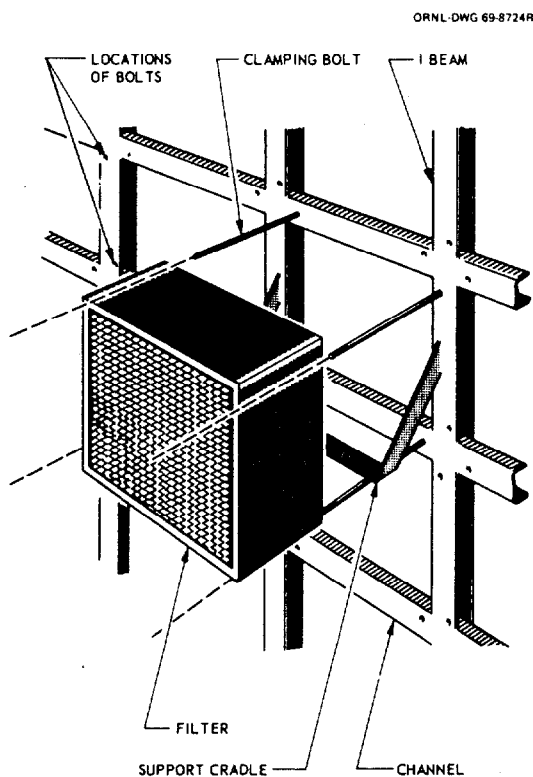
Face-sealed mounting of HEPA filter. Note eight-bolt clamping and support cradle. Frame is all-weld construction, using structural I-beams and channels.
